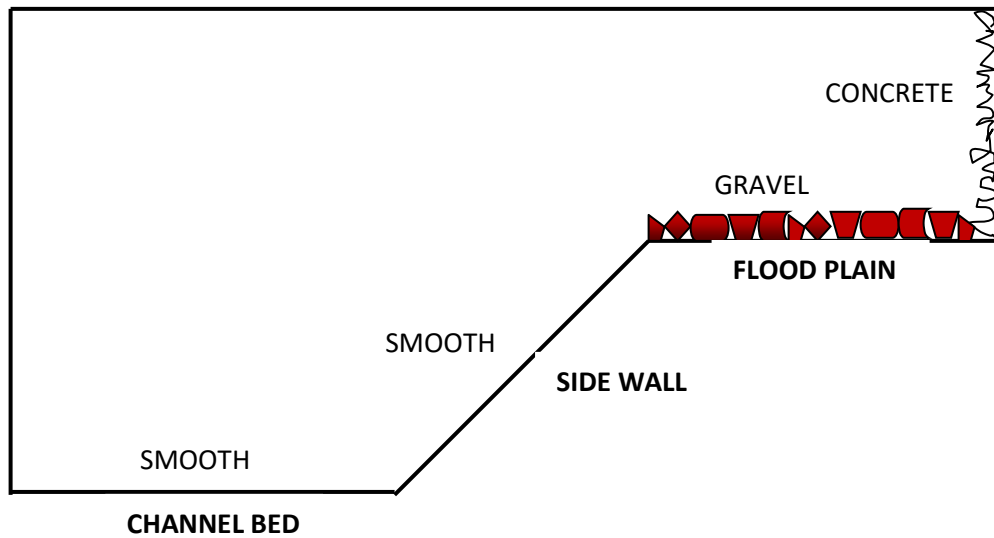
Half Cross Sectional View Of Trapezoidal Channel
